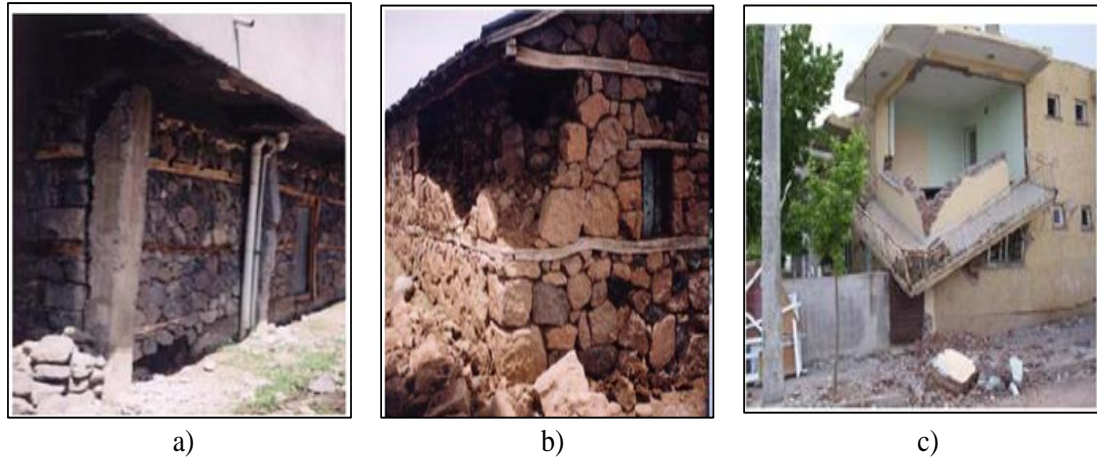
Failure of Masonry Buildings; a,b) Stone Wall Failure, c) Brick Wall Failure [8].
